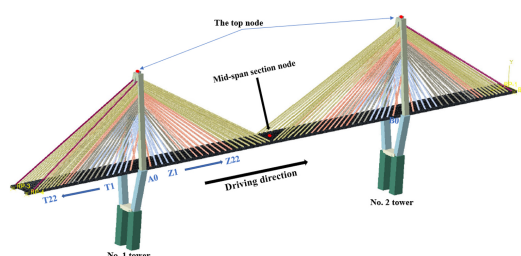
Finite element model of Ganxigou Cable-Stayed Bridge
